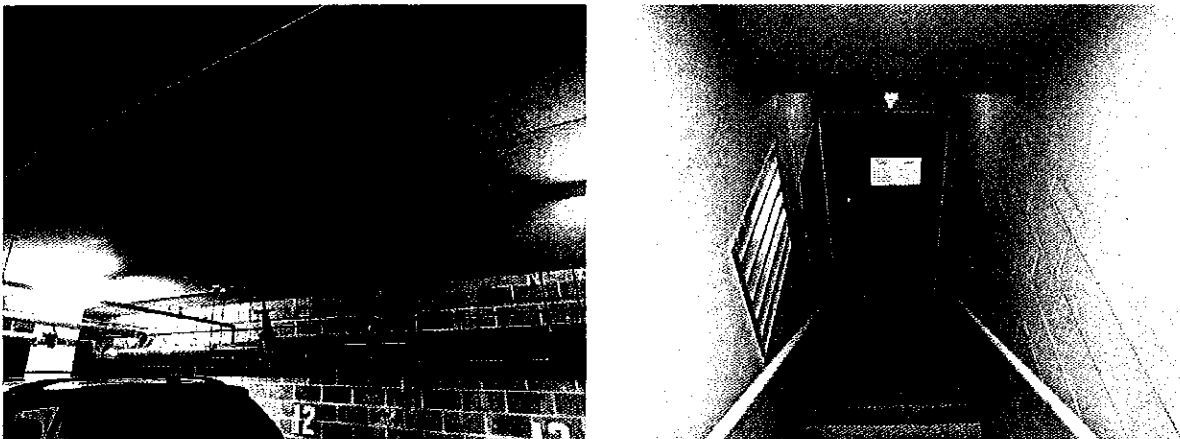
A section of the suspended slab (left). Northwest stairwell at the rear laneway (right).
